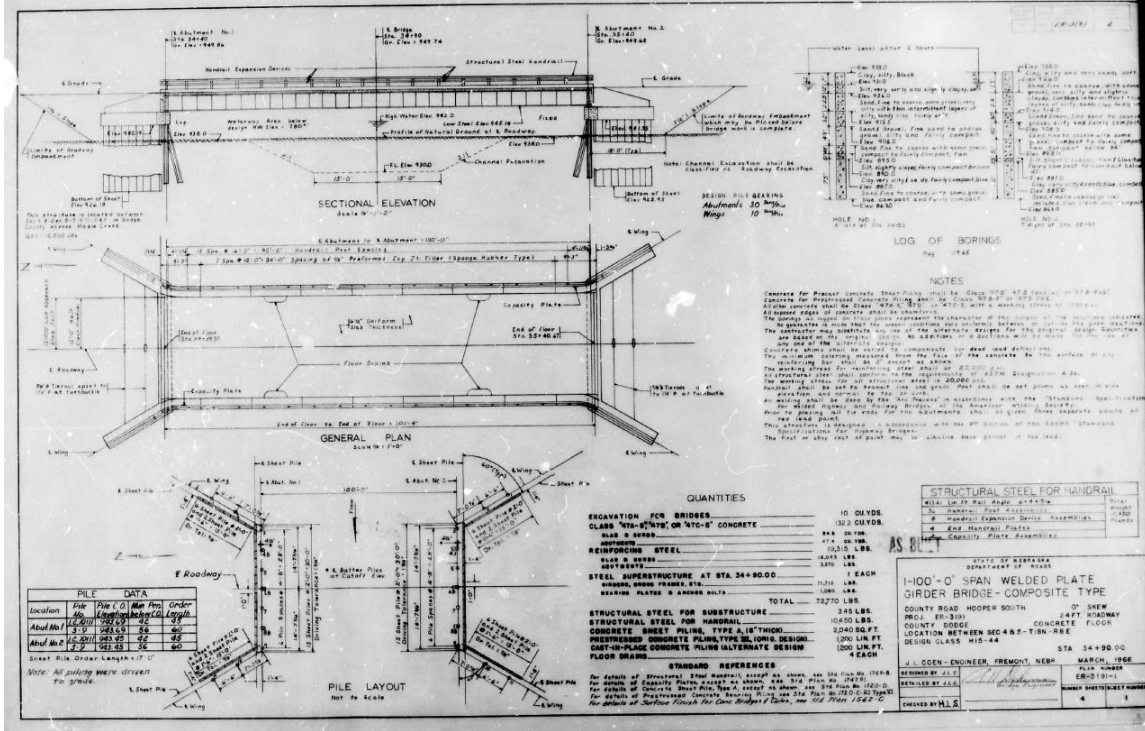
Hooper Bridge Plan (courtesy of NDOT).
